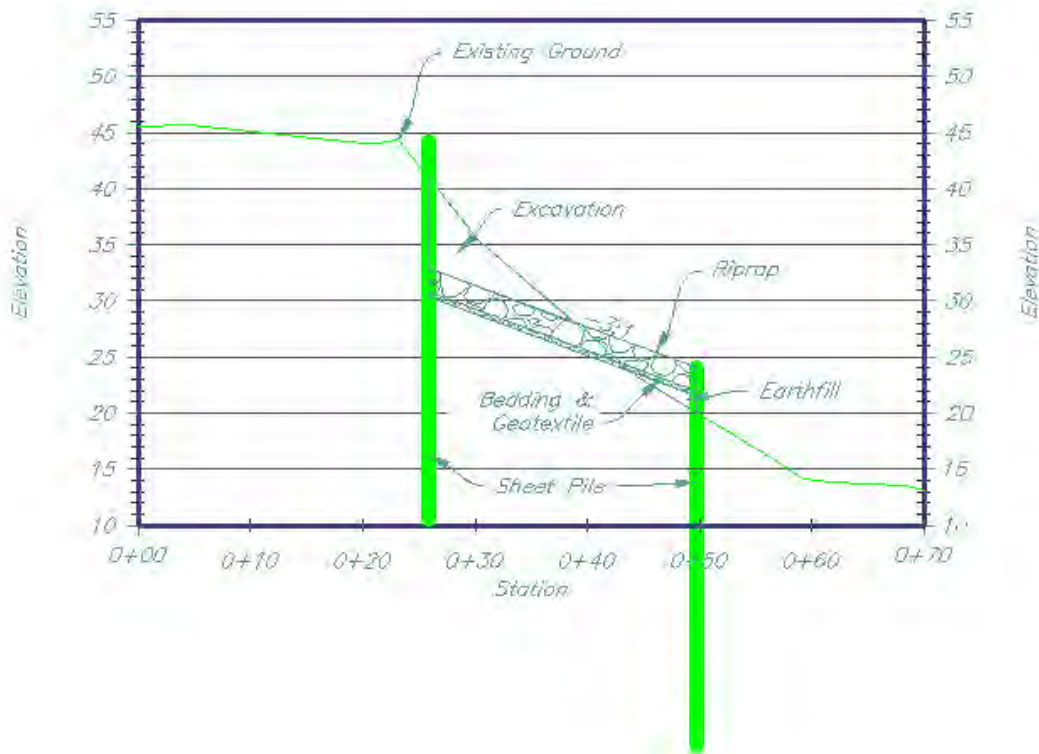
Cross-section of sheet pile wall streambank treatment concept
